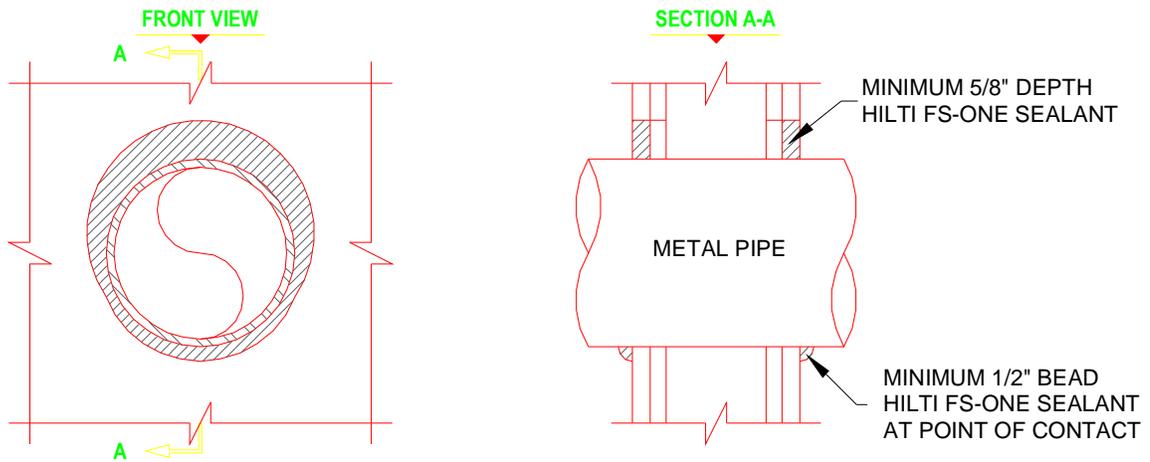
BUILDING SERVICES PIPE THROUGH WALL/FLOOR
